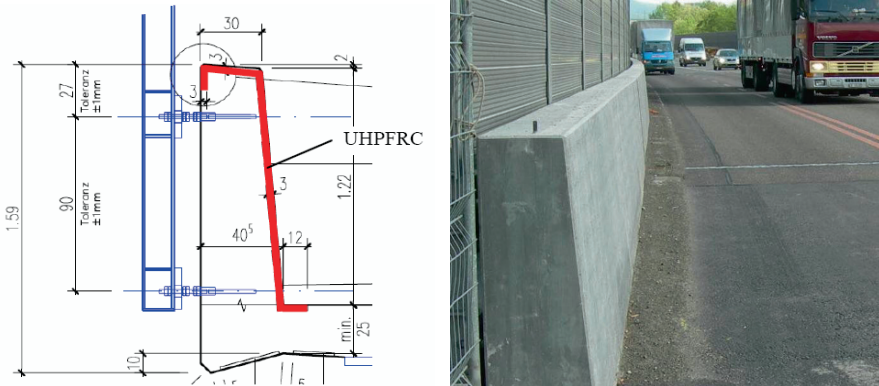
Typical cross section of the crash barrier wall and view after rehabilitation
